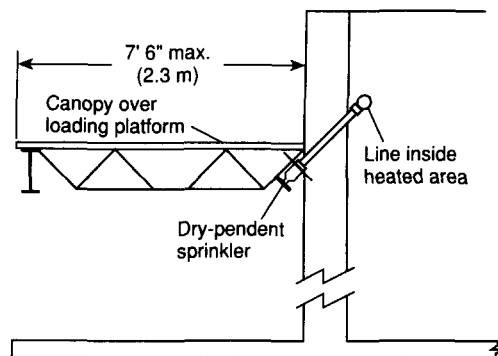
Dry-pendent sprinklers for protection of covered platforms, loading docks, and similar areas.
